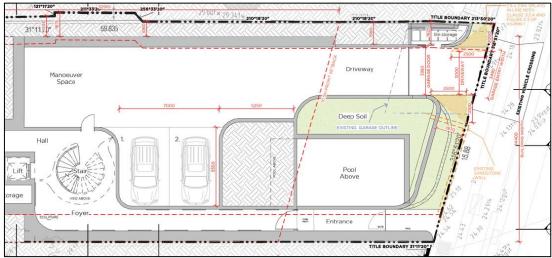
Example of a vehicle turning area in the basement level of a dwelling house
